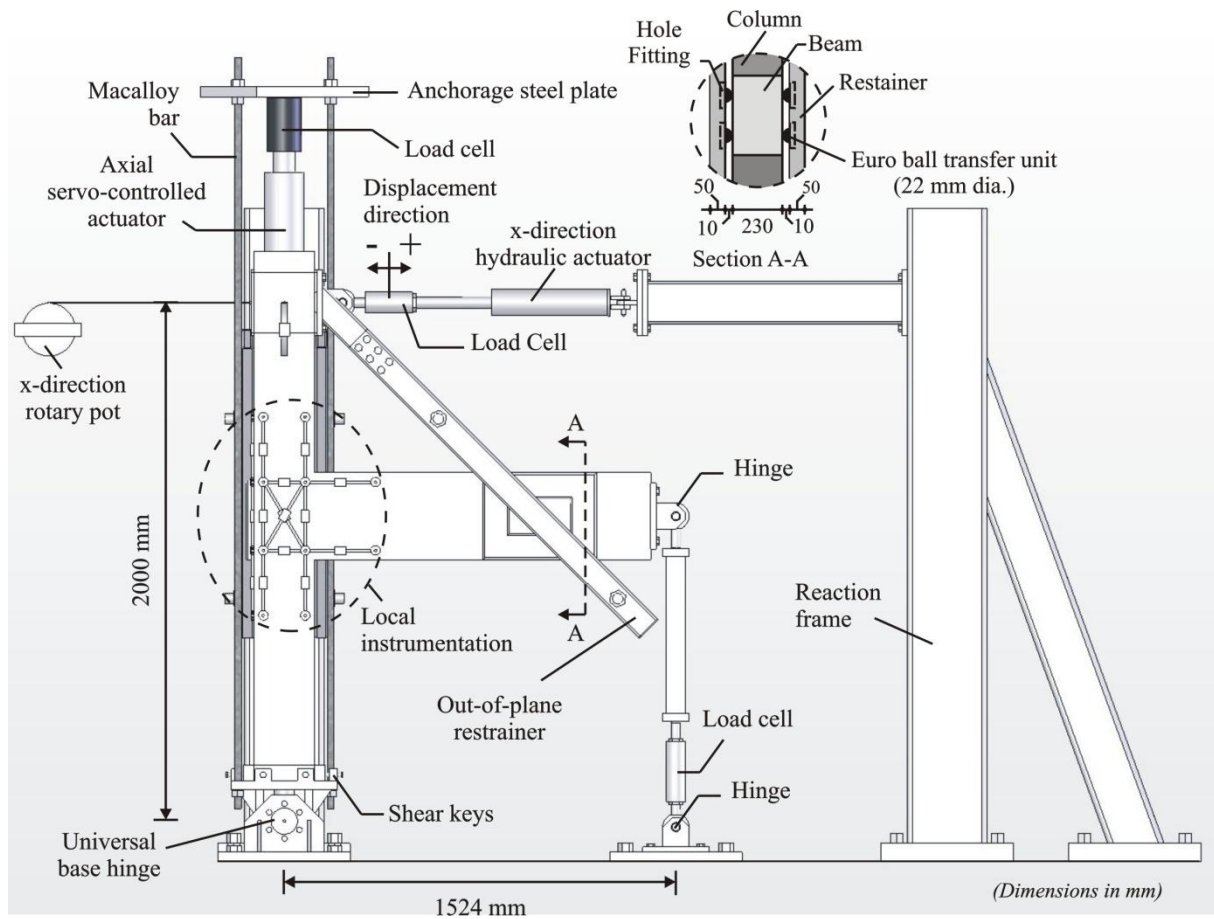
Test setup for 3D specimens: front view, x-direction
